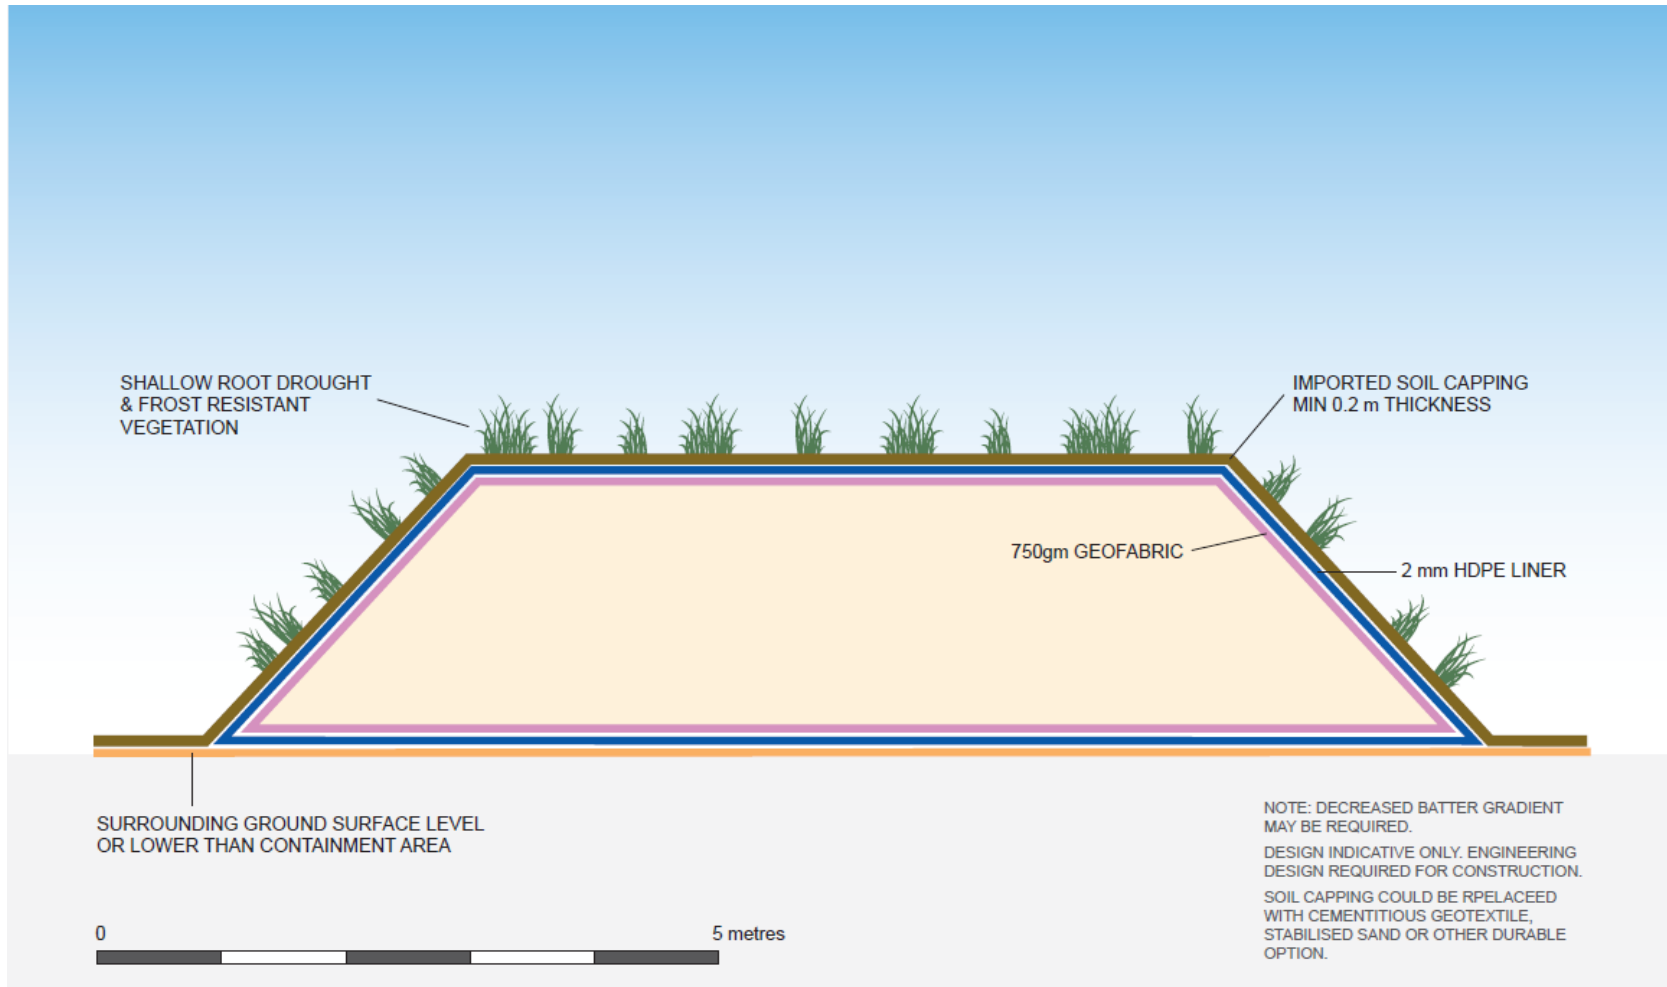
Conceptual cross section for above ground containment system at Area Option 1
